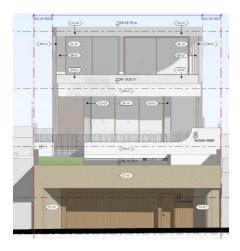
Originally proposed front elevation under the subject DA - 8 Victory Street, Clovelly (Source: BJB Architects Pty Ltd)
